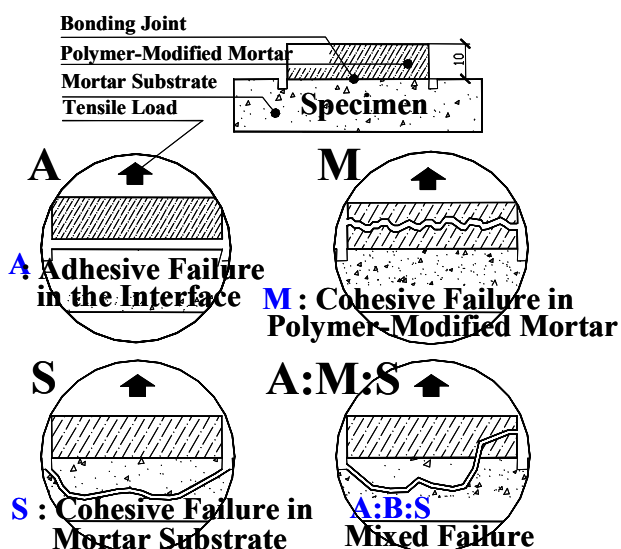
Types of Failure Modes of Specimens in Adhesion Test.
